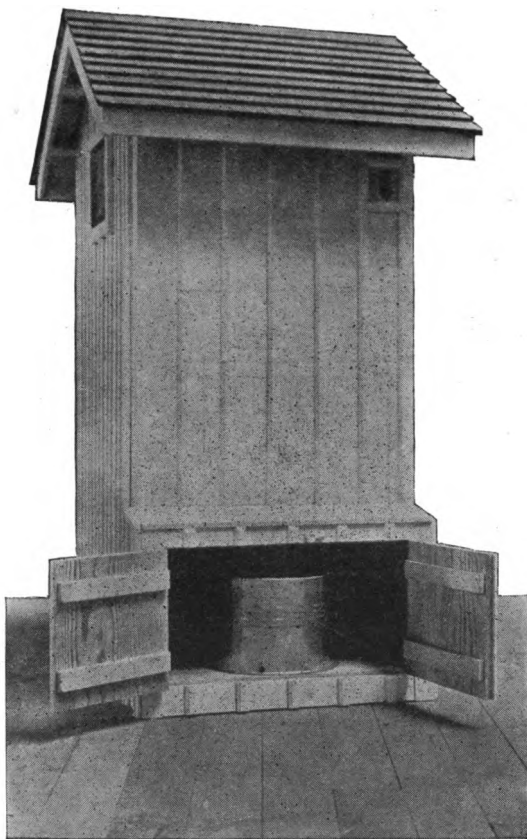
FIG. XIII—Rear view of a model of Privy with removable receptacle.
